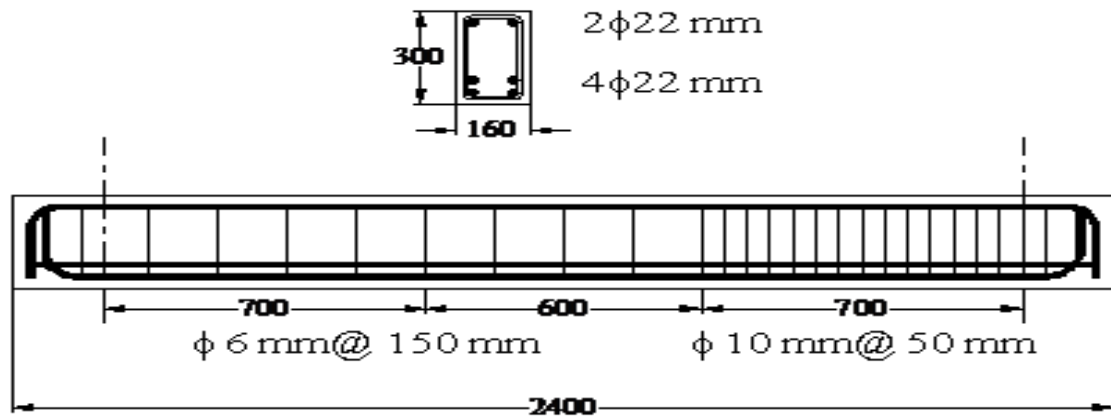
Geometry and arrangement of reinforcement for control specimen (Morsy et al, 2011) [6]
